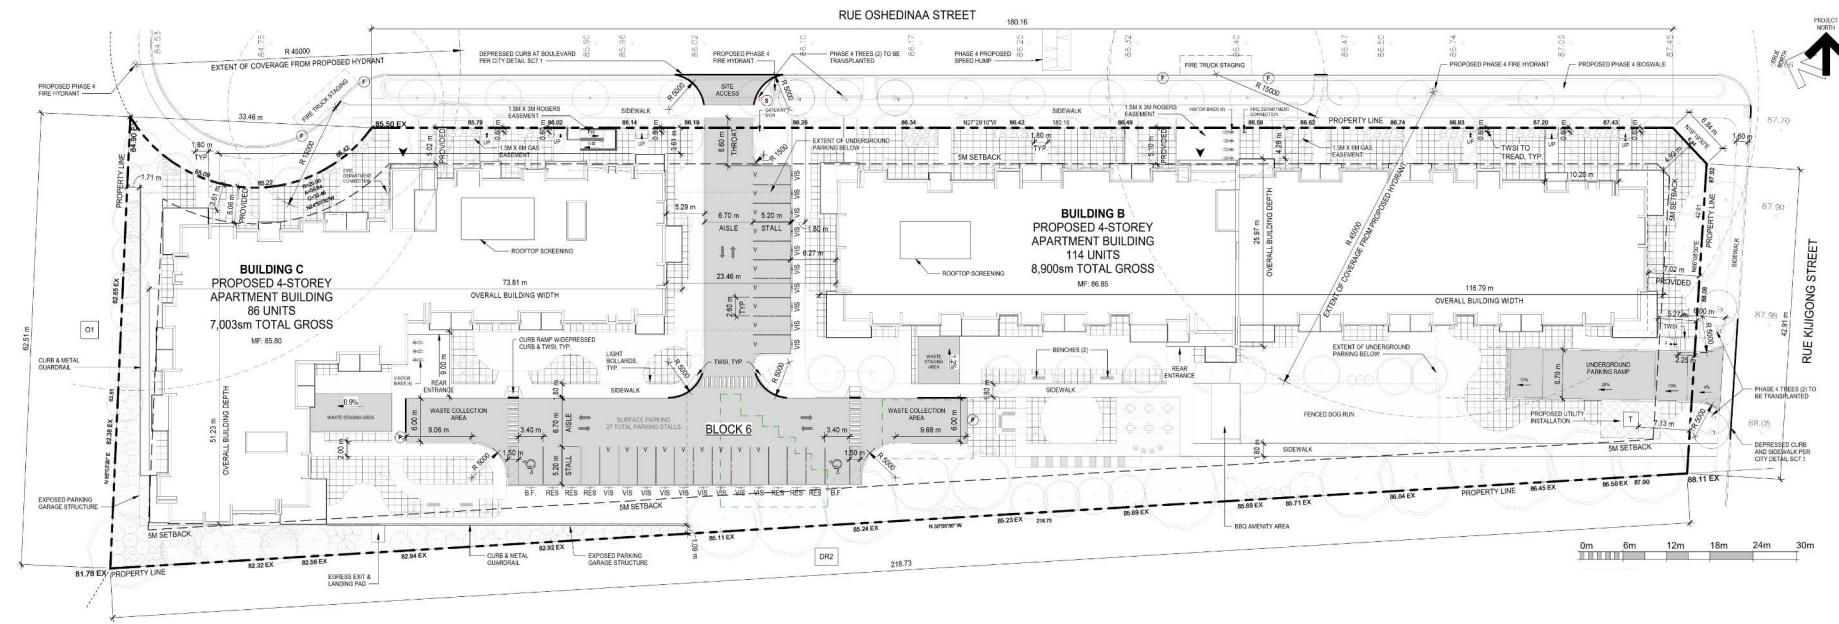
Block 6 site plan from roof level (September 2024).
